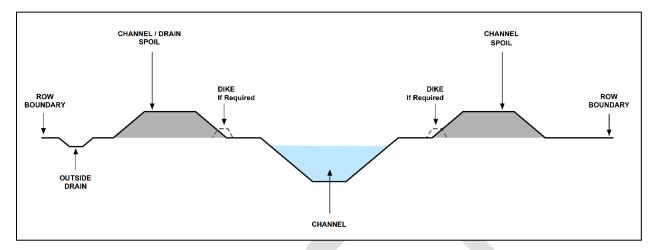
Typical Cross-Section of the Lake Manitoba Outlet Channel
